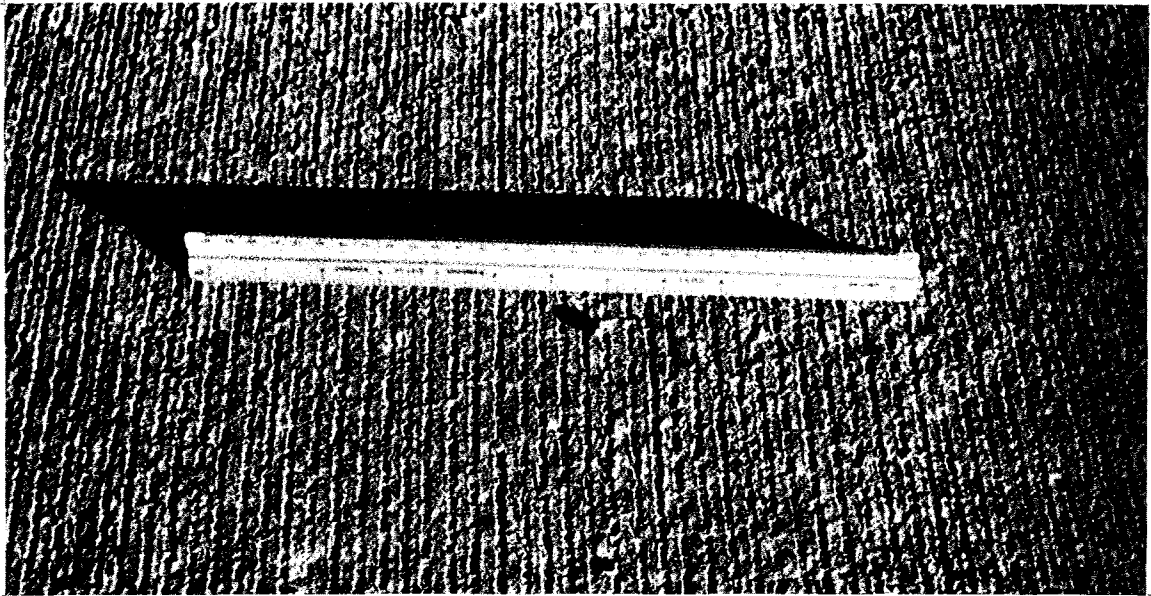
Test Section F-19: 1/4 in. Transverse Tine Finish (As Constructed)
